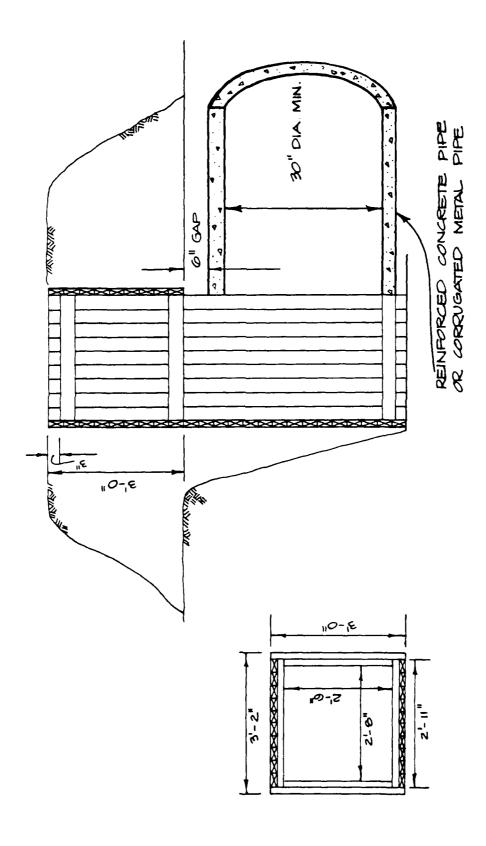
Typical Entryway to Buried Shelter With Culvert Shown.
